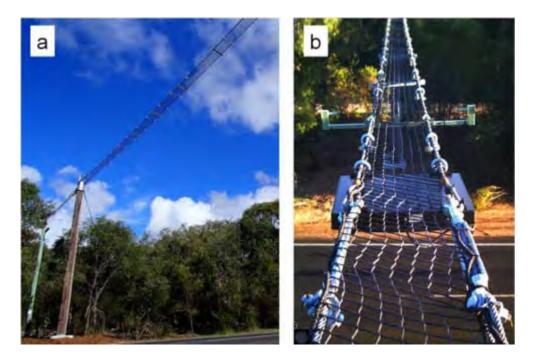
The first rope bridge constructed over Caves Rd, Busselton.
